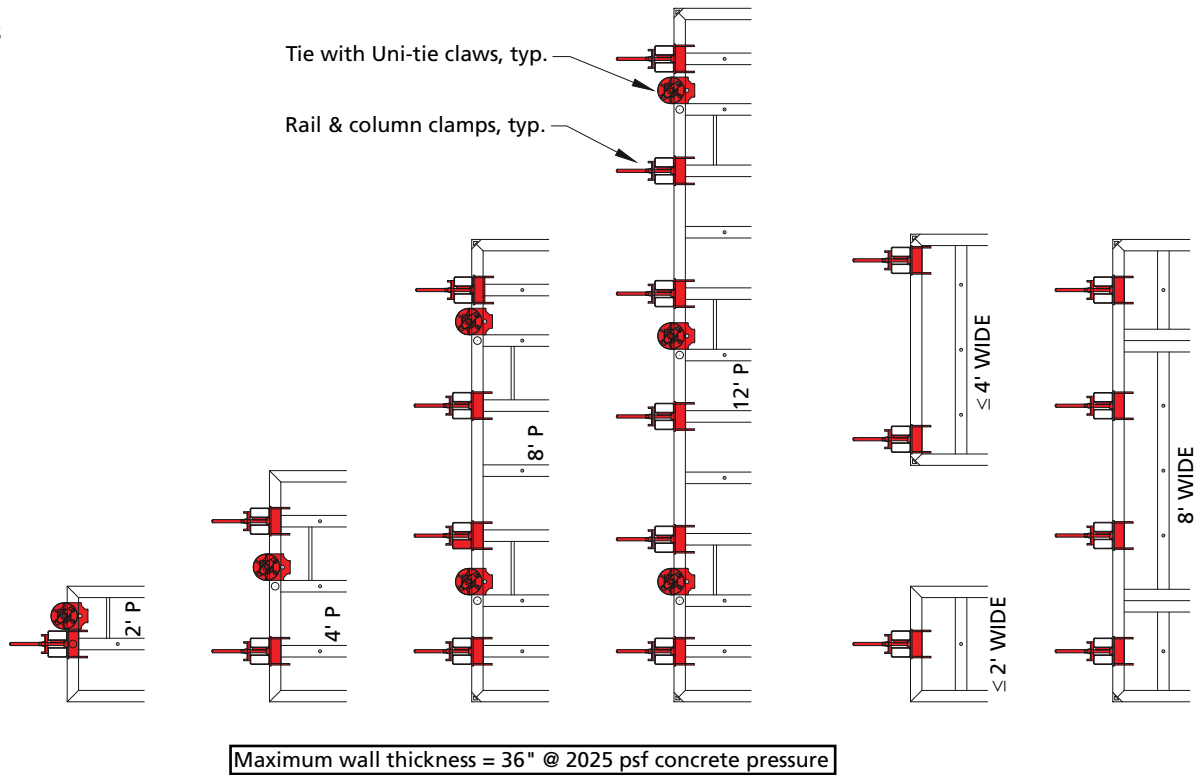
Steel rail bulkhead supports - supplemental configuration
